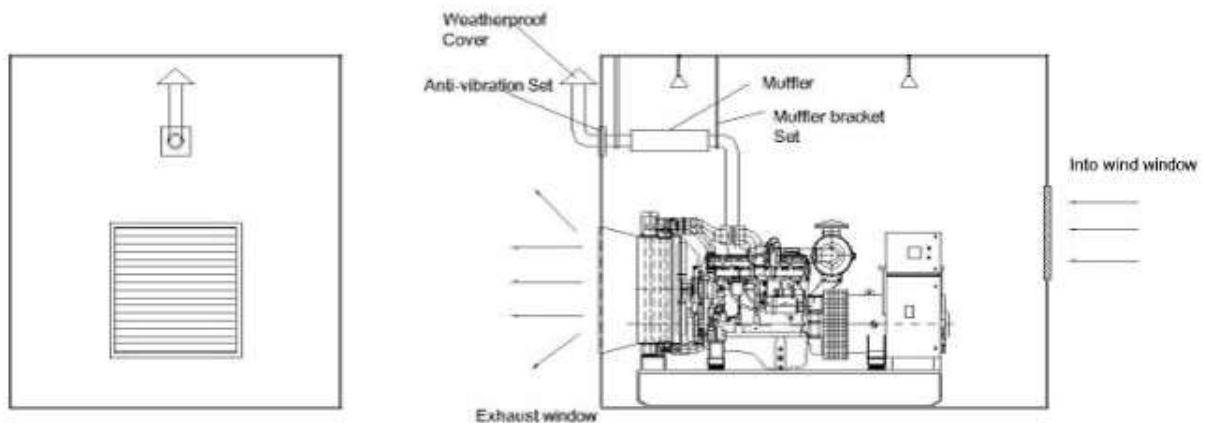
A Typical Ventilation arrangement for Water Cooled Engines
